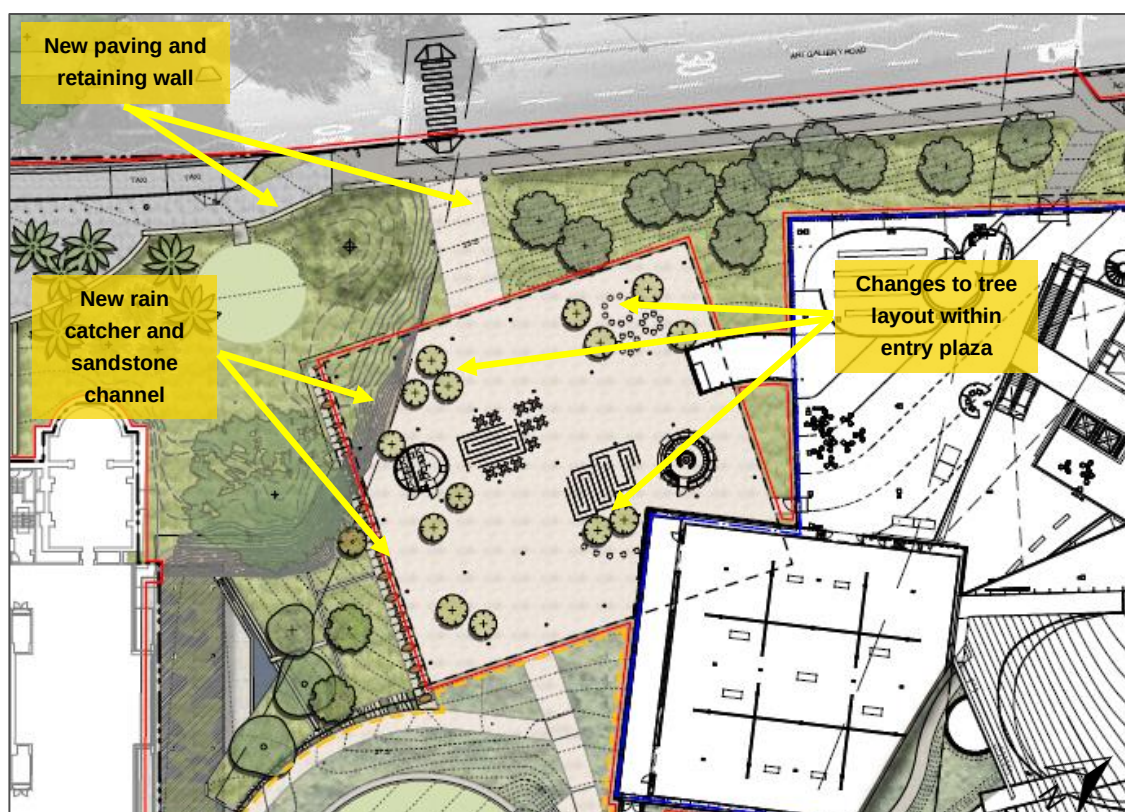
| Modified landscape design of Entry Plaza (Base source: RTS proposed landscape plans)
